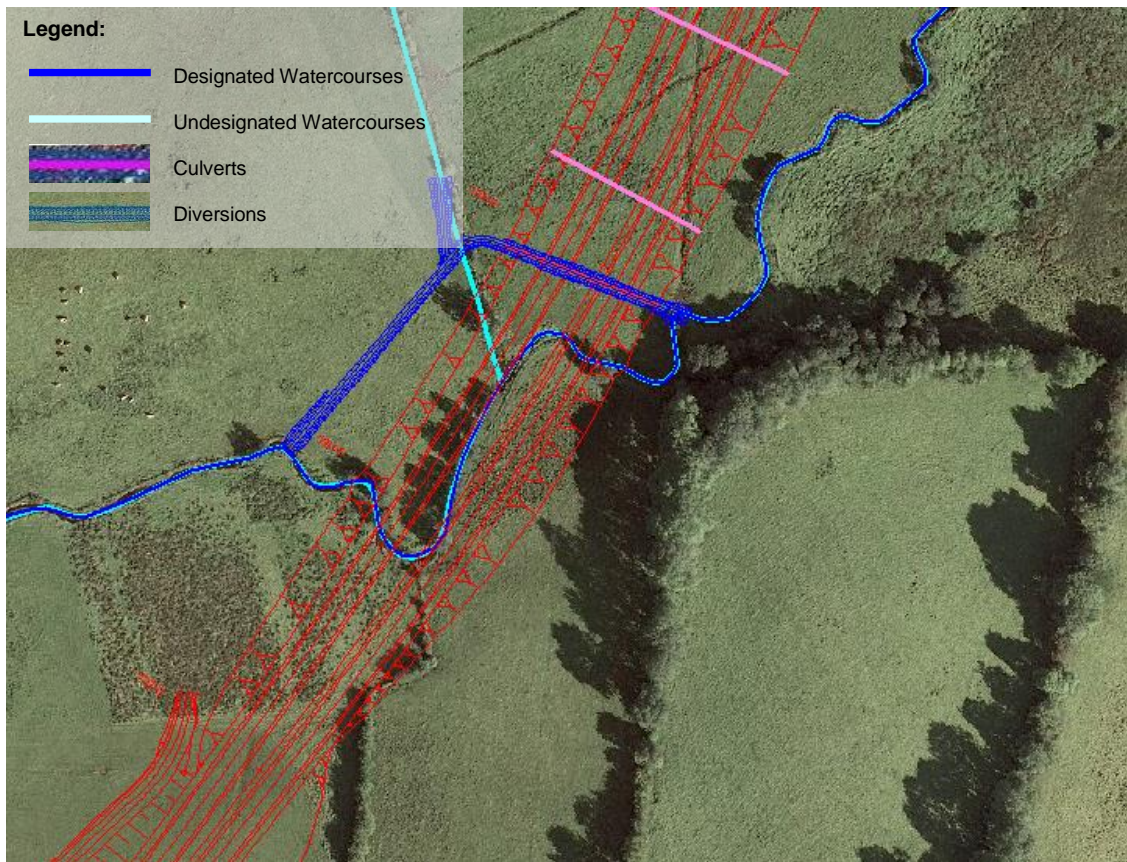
Plan of Lisadavil River and Undesignated Watercourse Diversion (S3-WD-39 and S3-WD-40), Culvert Arrangement (S3-PC-48) and Connectivity Culvert Arrangement (S3-CC-06 and S3-CC-07)
